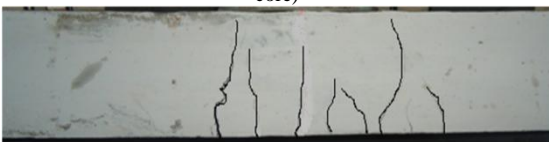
Beam - Wdc2 (Double layered welded wire mesh with concrete core)
